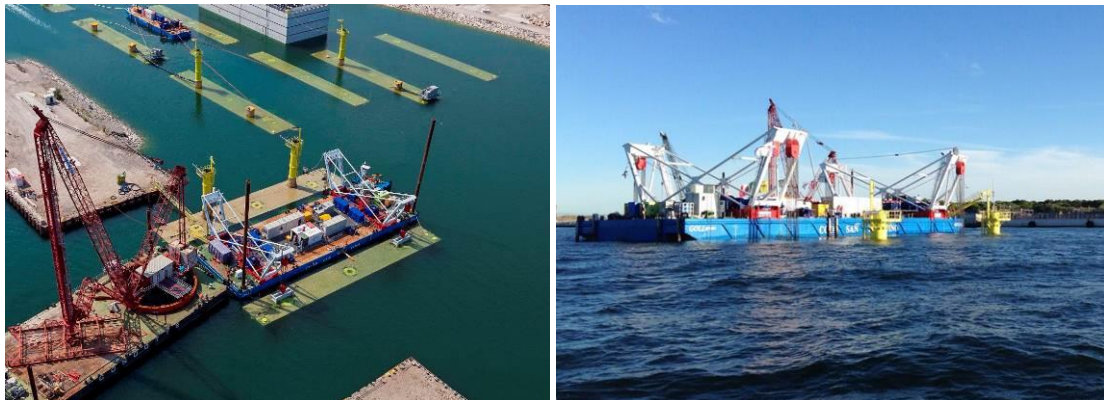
Left: transport of caisson from building site, right: nearly placed caisson under wave action.
